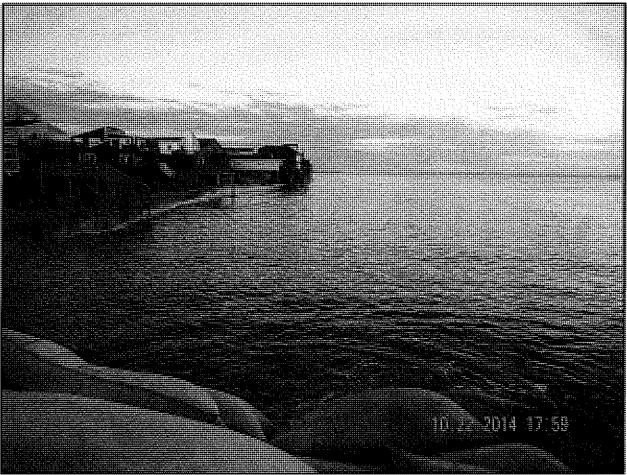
October 22, 2014 photo looking north from Building #1 of Topsail Reef.
